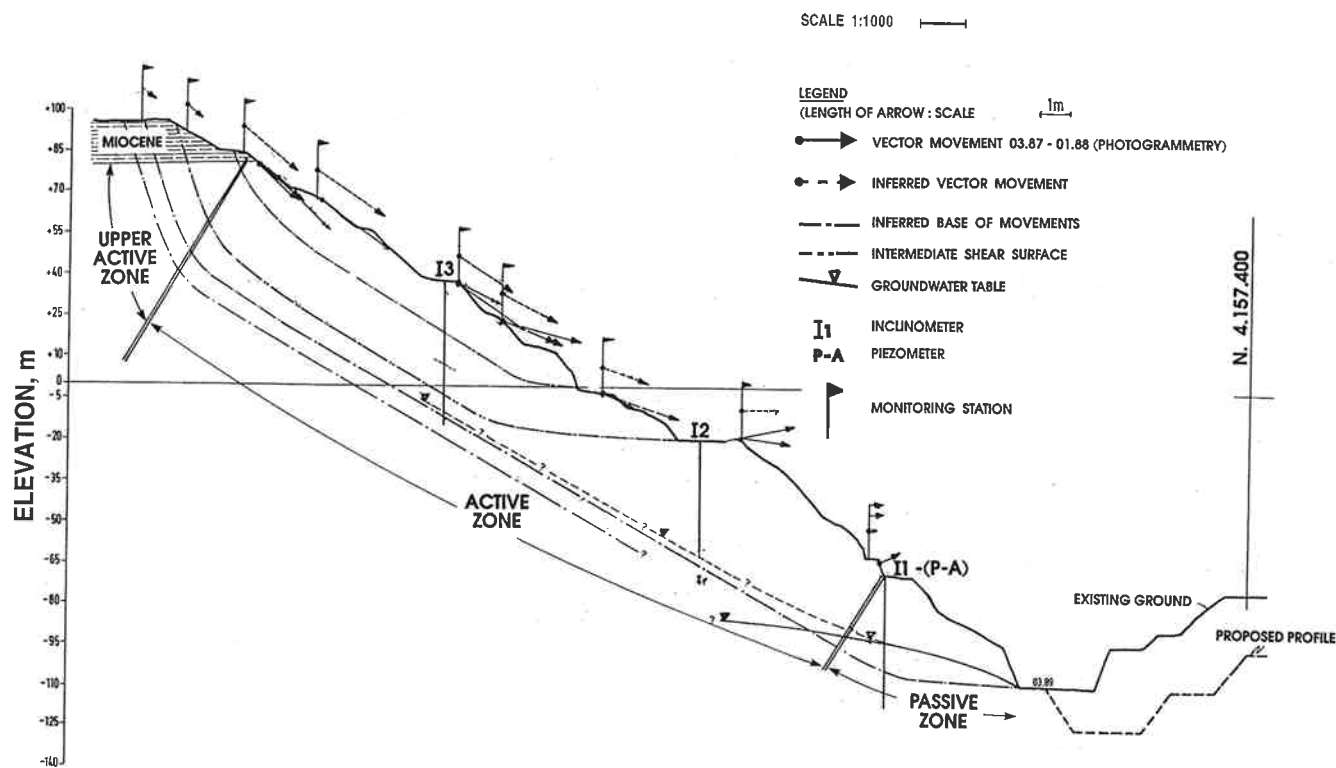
Schematic cross-section of footwall slope at Aznalcóllar showing inferred stability conditions
